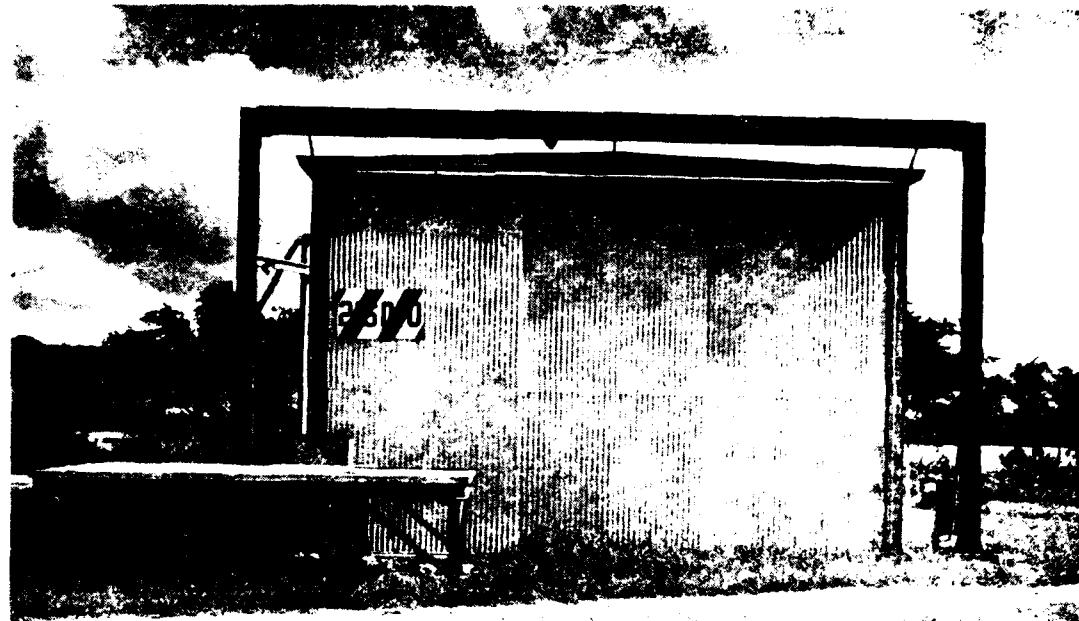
Above-Ground Storehouse -- Temporary Storage.
